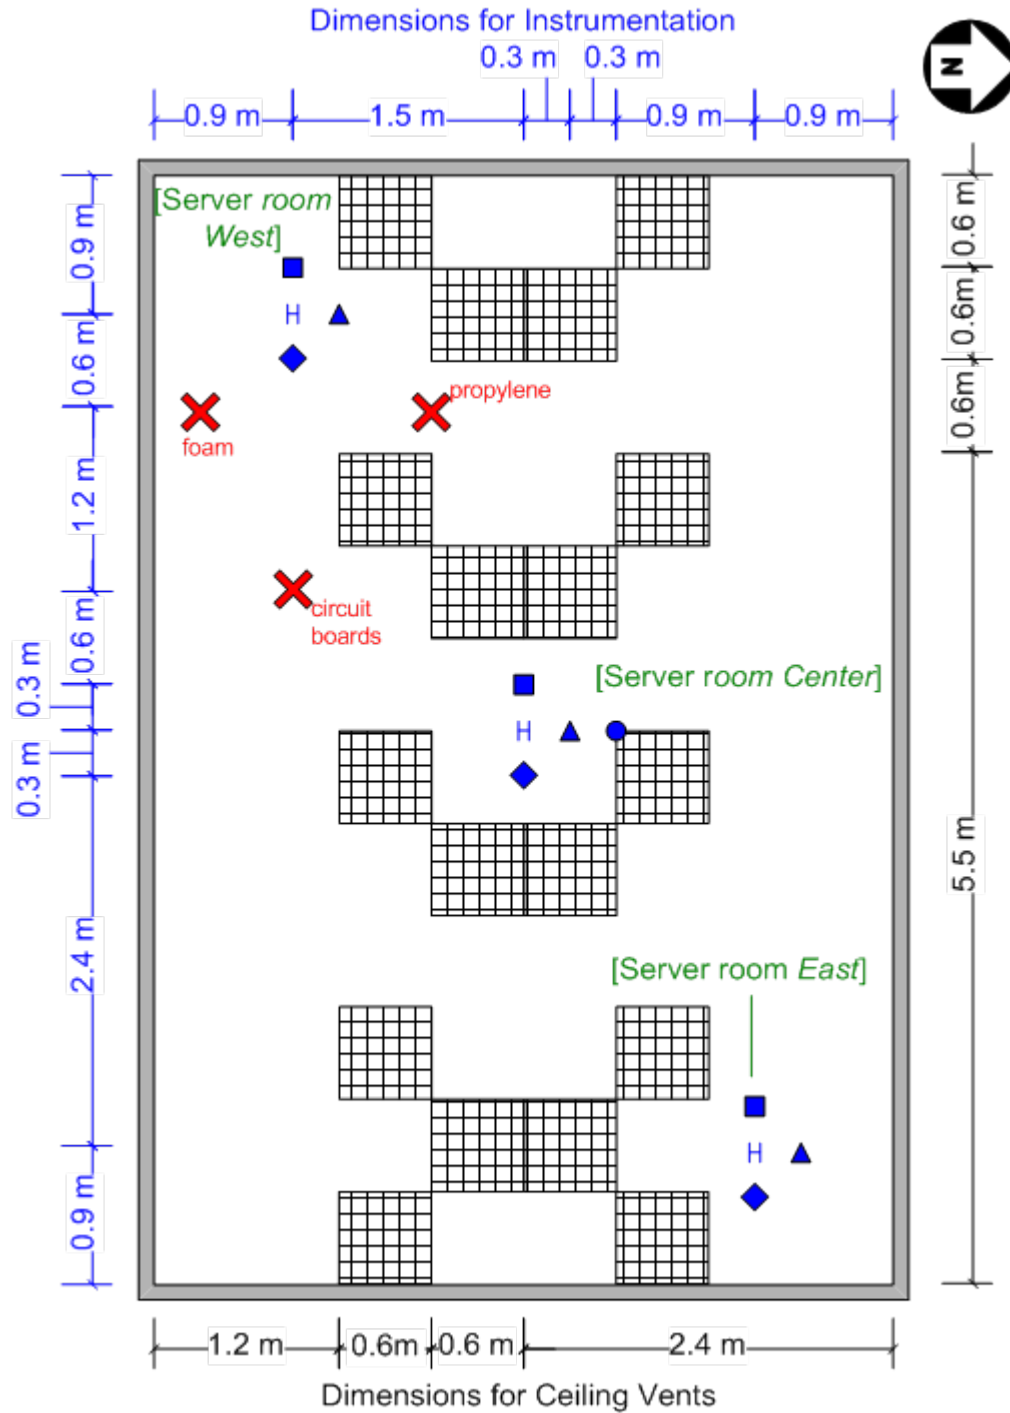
Plan view of the ceiling vents, instrumentation and smoke source location at Segment C-C of Figure 2-2 and Figure 2-3 (suspended ceiling) in the server room. Smoke source in the cold aisle (foam) and hot aisle (propylene) were placed on the floor while the circuit boards were placed at an elevation of 0.9 m (39 in.) in the server cabinet.
